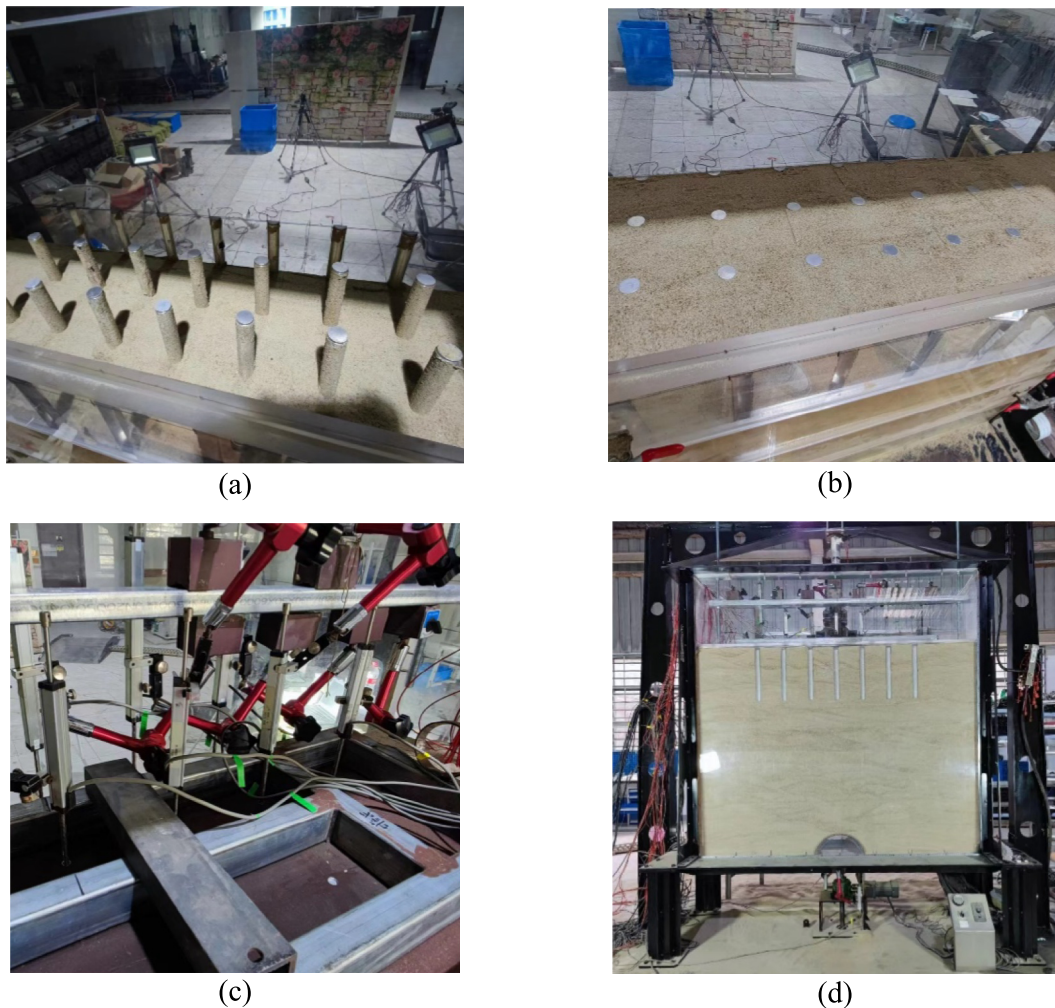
Testing process. (a) Pile embedment, (b) soil filling completed, (c) LVDT layout, and (d) layout completed.
